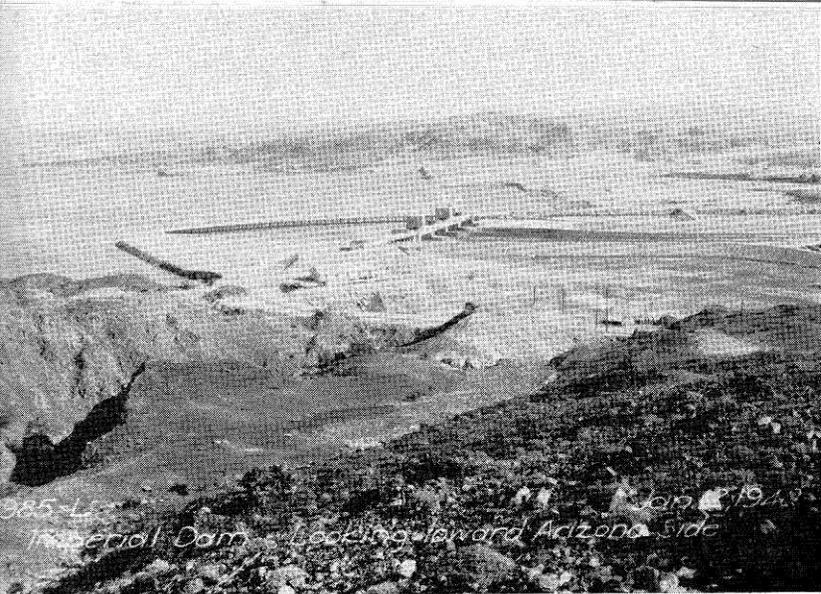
Imperial Dam, looking toward the Arizona side. Rockwood Heading is to the far right.
